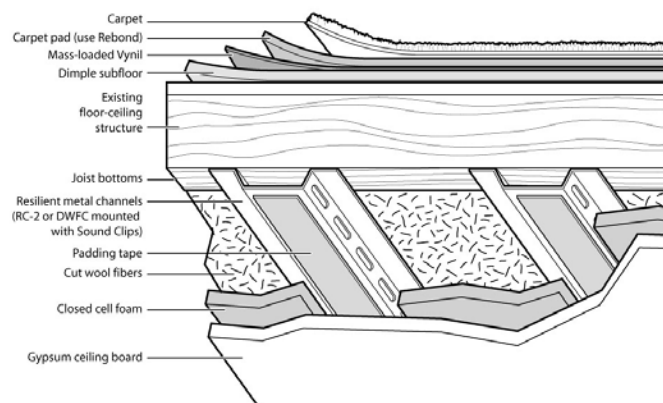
An example of MLV and resilient metal channels installed in a ceiling structure.
